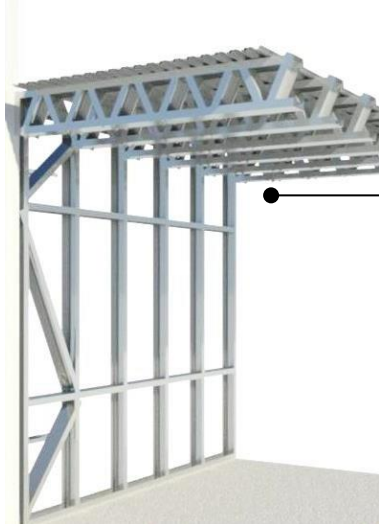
DETAILS OF LOAD-BEARING STEEL CONSTRUCTION ELEMENTS:
